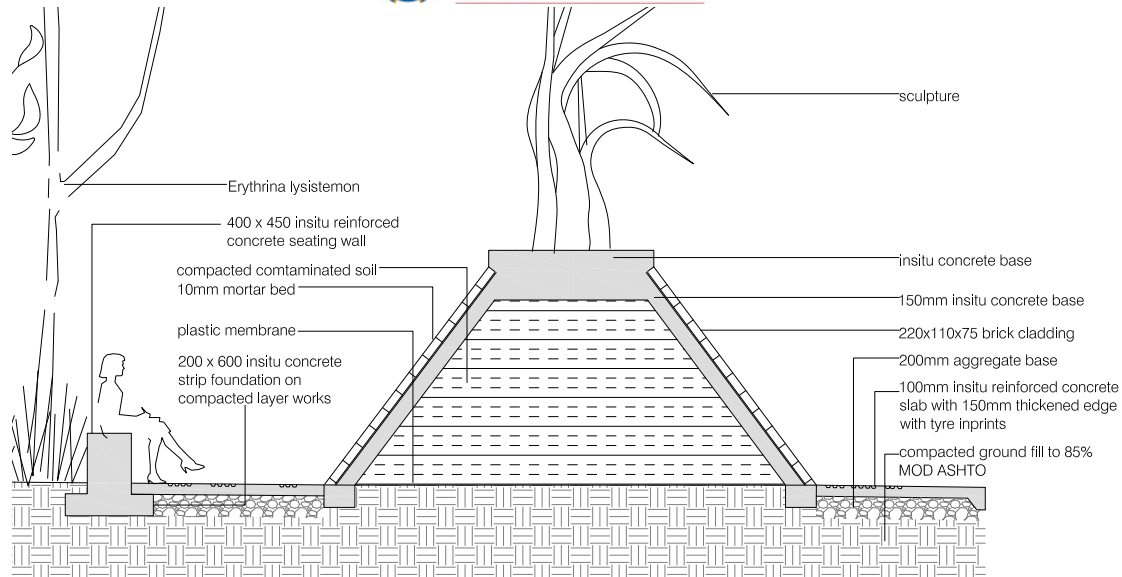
Sculptural capped mound. Detail B. Not to scale
